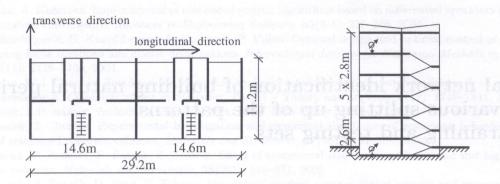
Plane and vertical section of the building WK-70 $\,$
